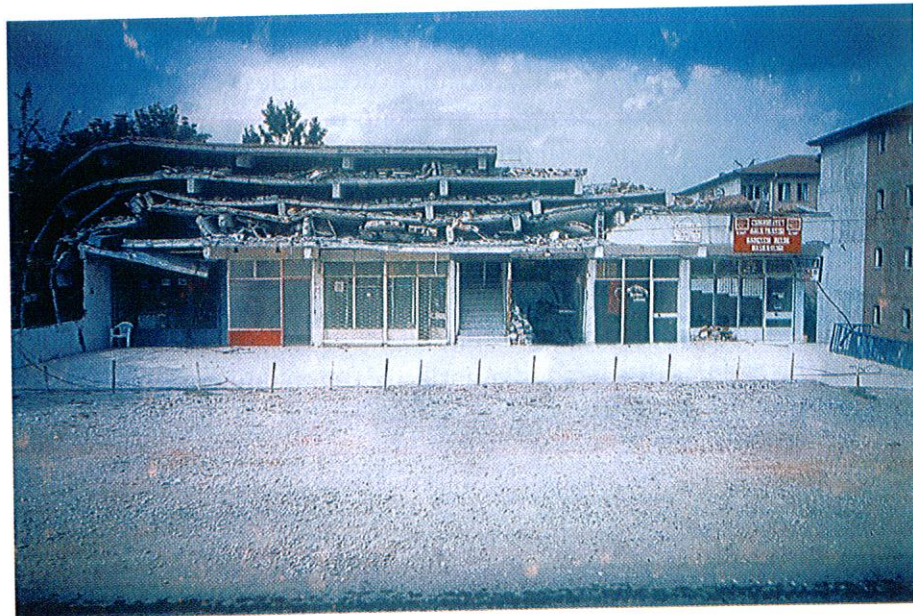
Building Collapse due to all the upper floors weak in long direction (Izmit, Turkey 1999)
